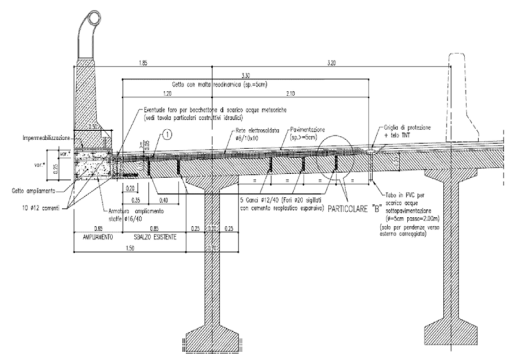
Extension and strengthening of the cantilever slab with CFRP bars.
